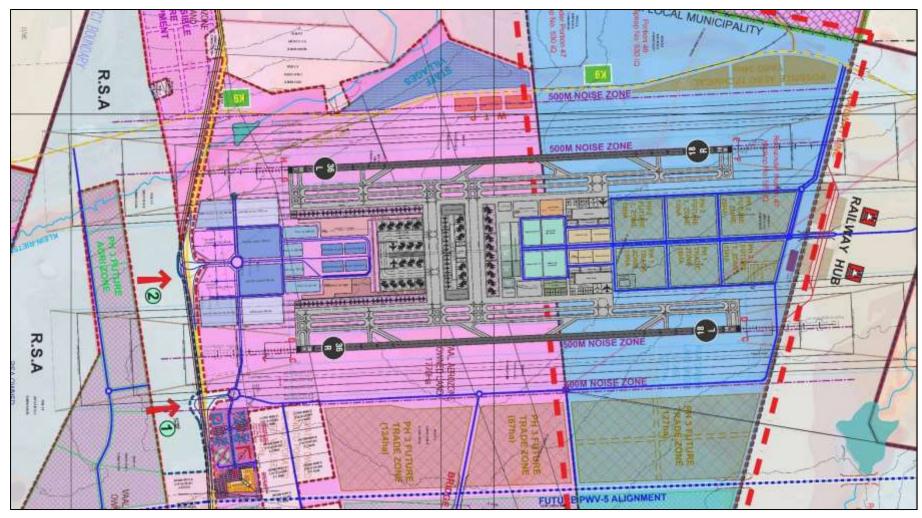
Internal Road Network and Access – Terminal and Trade Zone.
